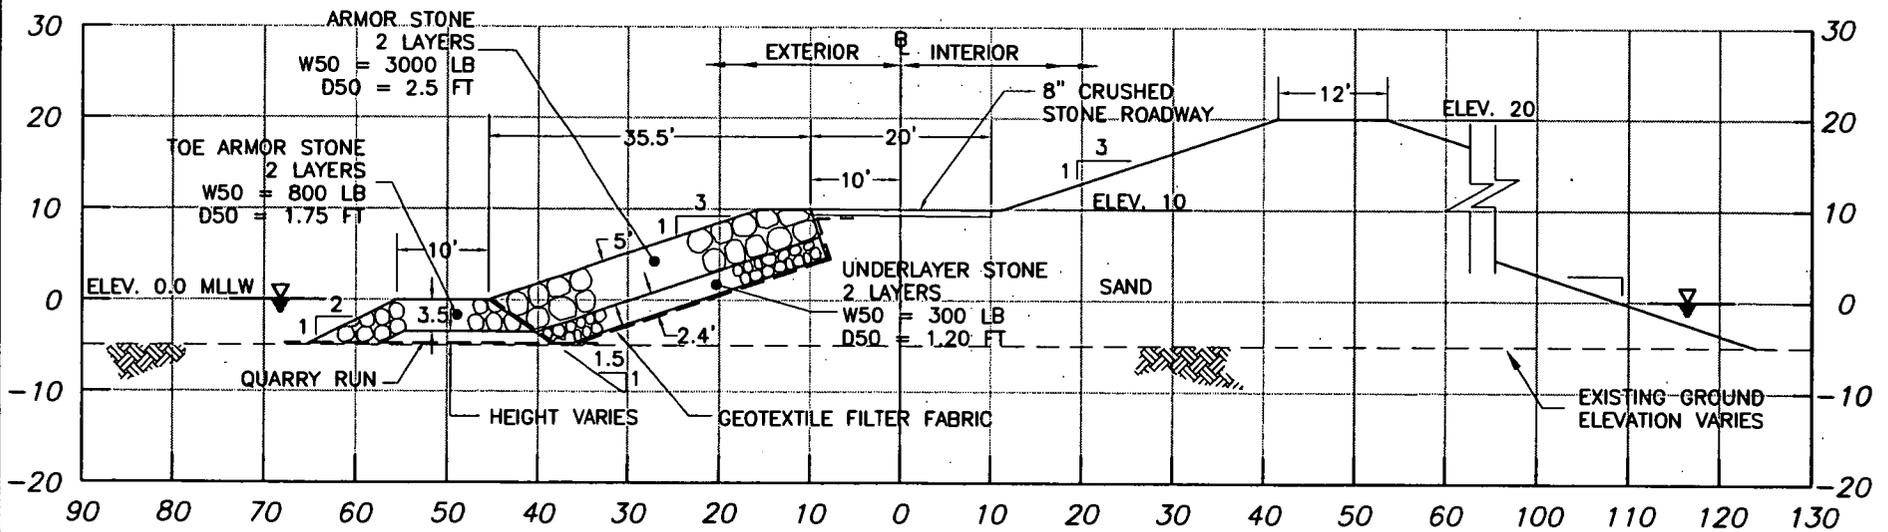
BARREN ISLAND TYPICAL DIKE SECTIONS
